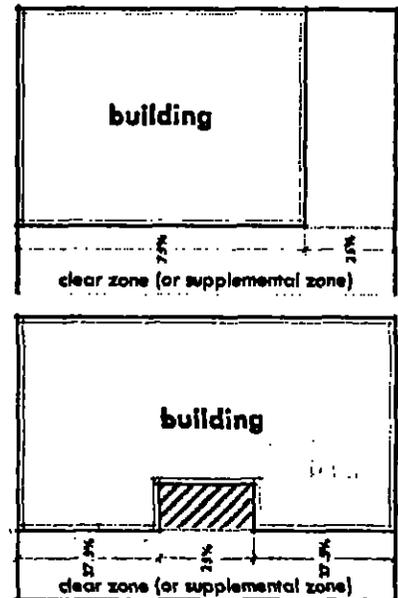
Examples of permitted building placement along core transit corridors. Parking is not permitted in the hatched area between the street-facing facade and the sidewalk.
